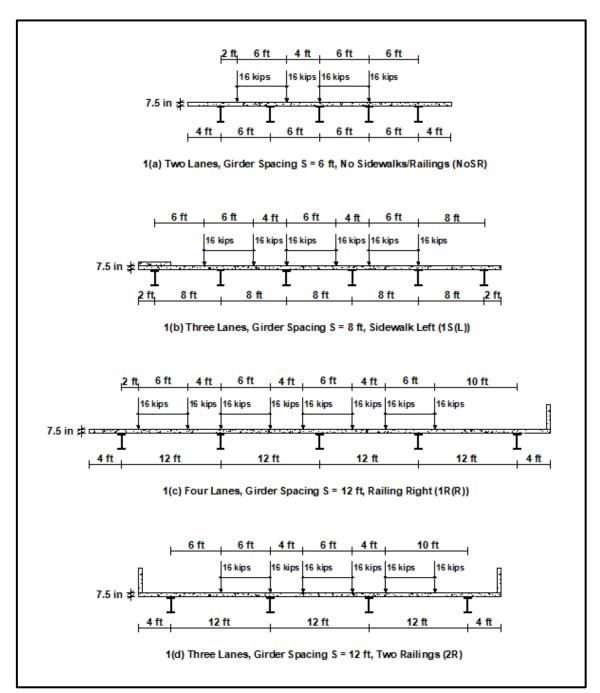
Typical Bridge Cross-Sections, with and without Sidewalks and/or Railings
